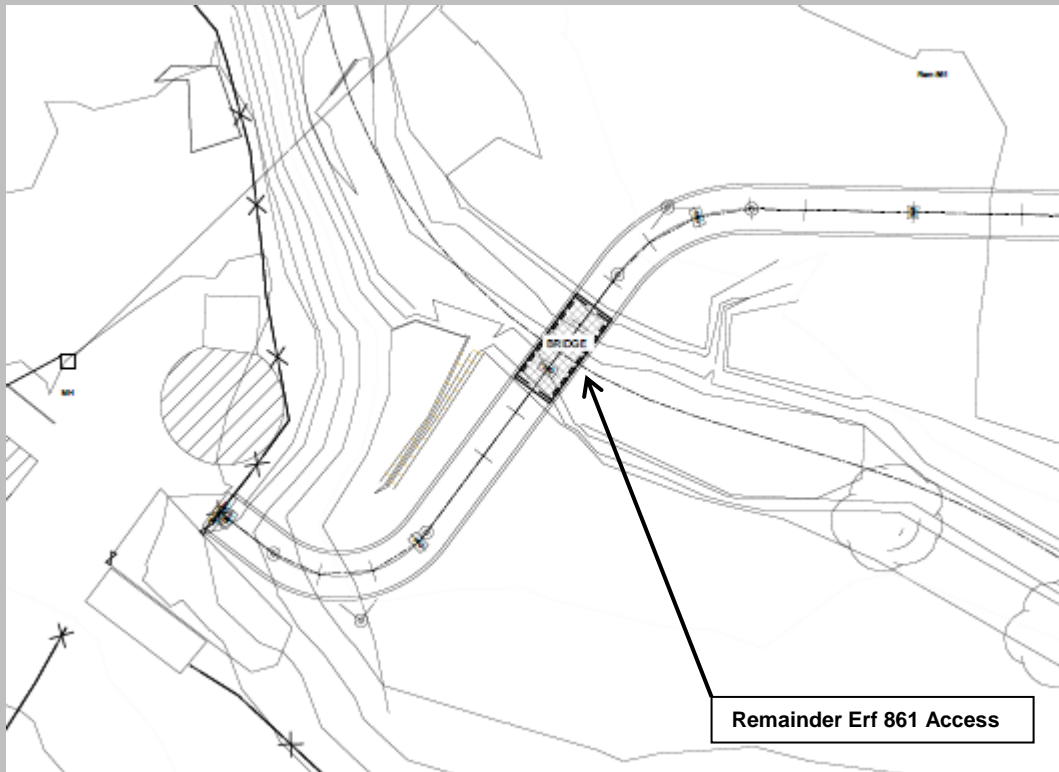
Location of the Remainder Erf 861 Access Road (Goba 2013).
